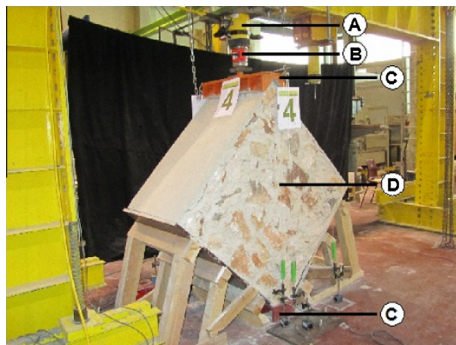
Test setup for diagonal compression test (dimensions in [cm]). A – Hydraulic jack, B – load cell, C – loading shoes and D – masonry panel.
